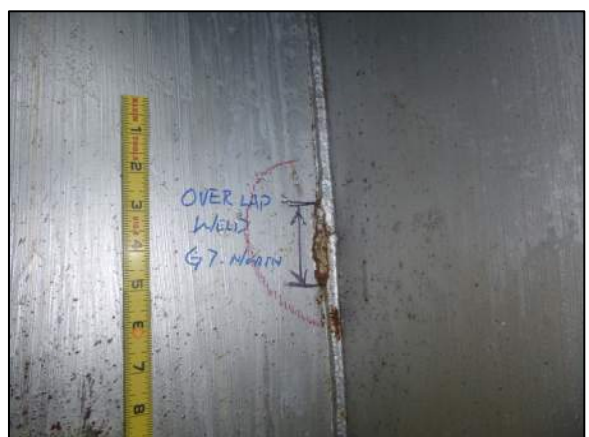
Overlapping weld with minor corrosion above girder tie plate on the north web of Pier Cap 16 at Girder 7.
